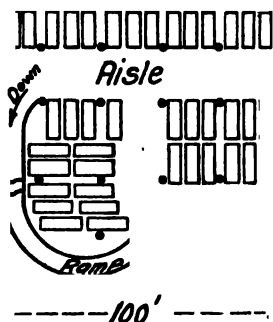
Floor plan garage 100 ft. square with curved ramps. Capacity 46 cars.
